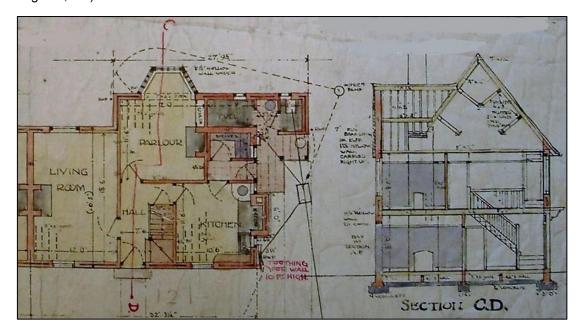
1909 ground floor design plan and cross section of 121 Willifield Way (reverse of No. 115) (Hampstead Garden Suburb Trust)
